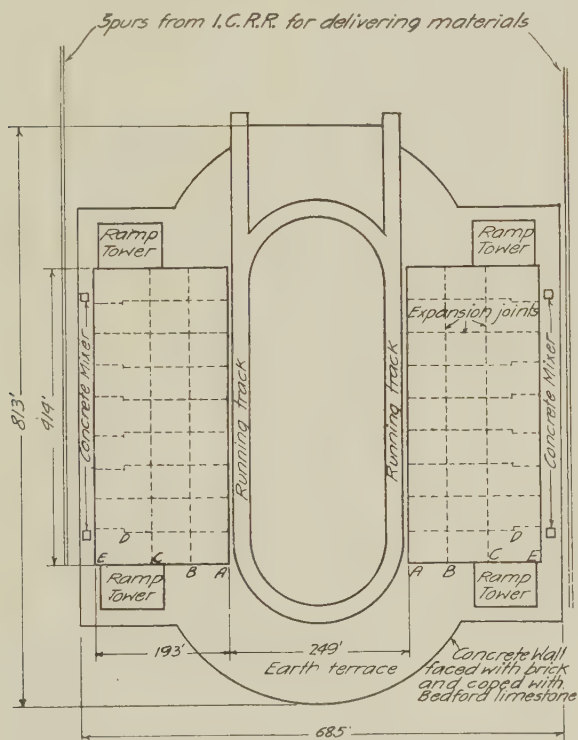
GENERAL PLAN OF STRUCTURE.
